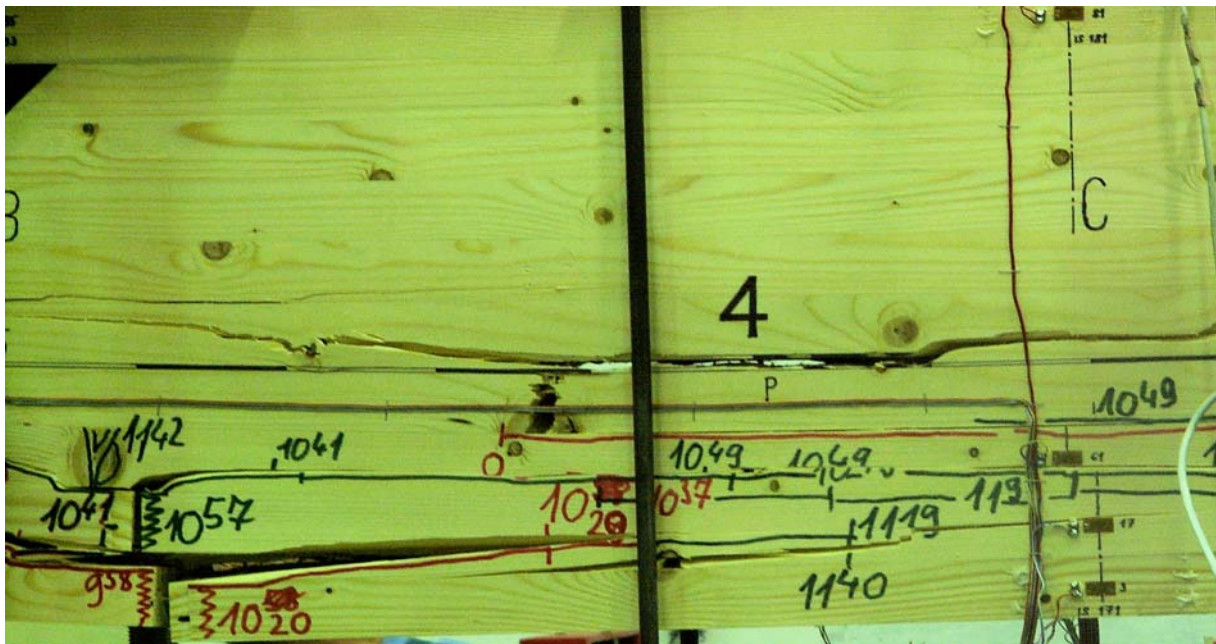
Detail of girder I-3 (RELAM with reinforcement) with propagation of cracks
